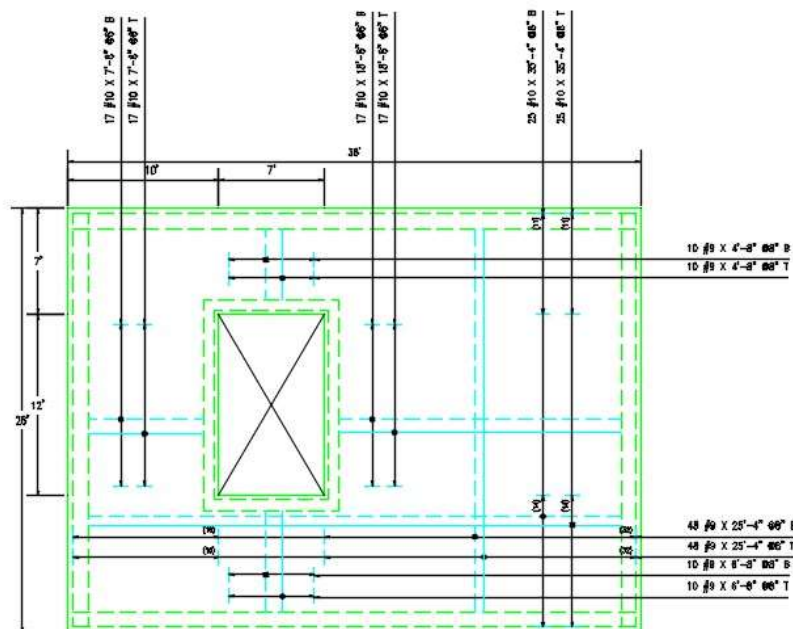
Reinforcement drawing showing the top and bottom Steel
